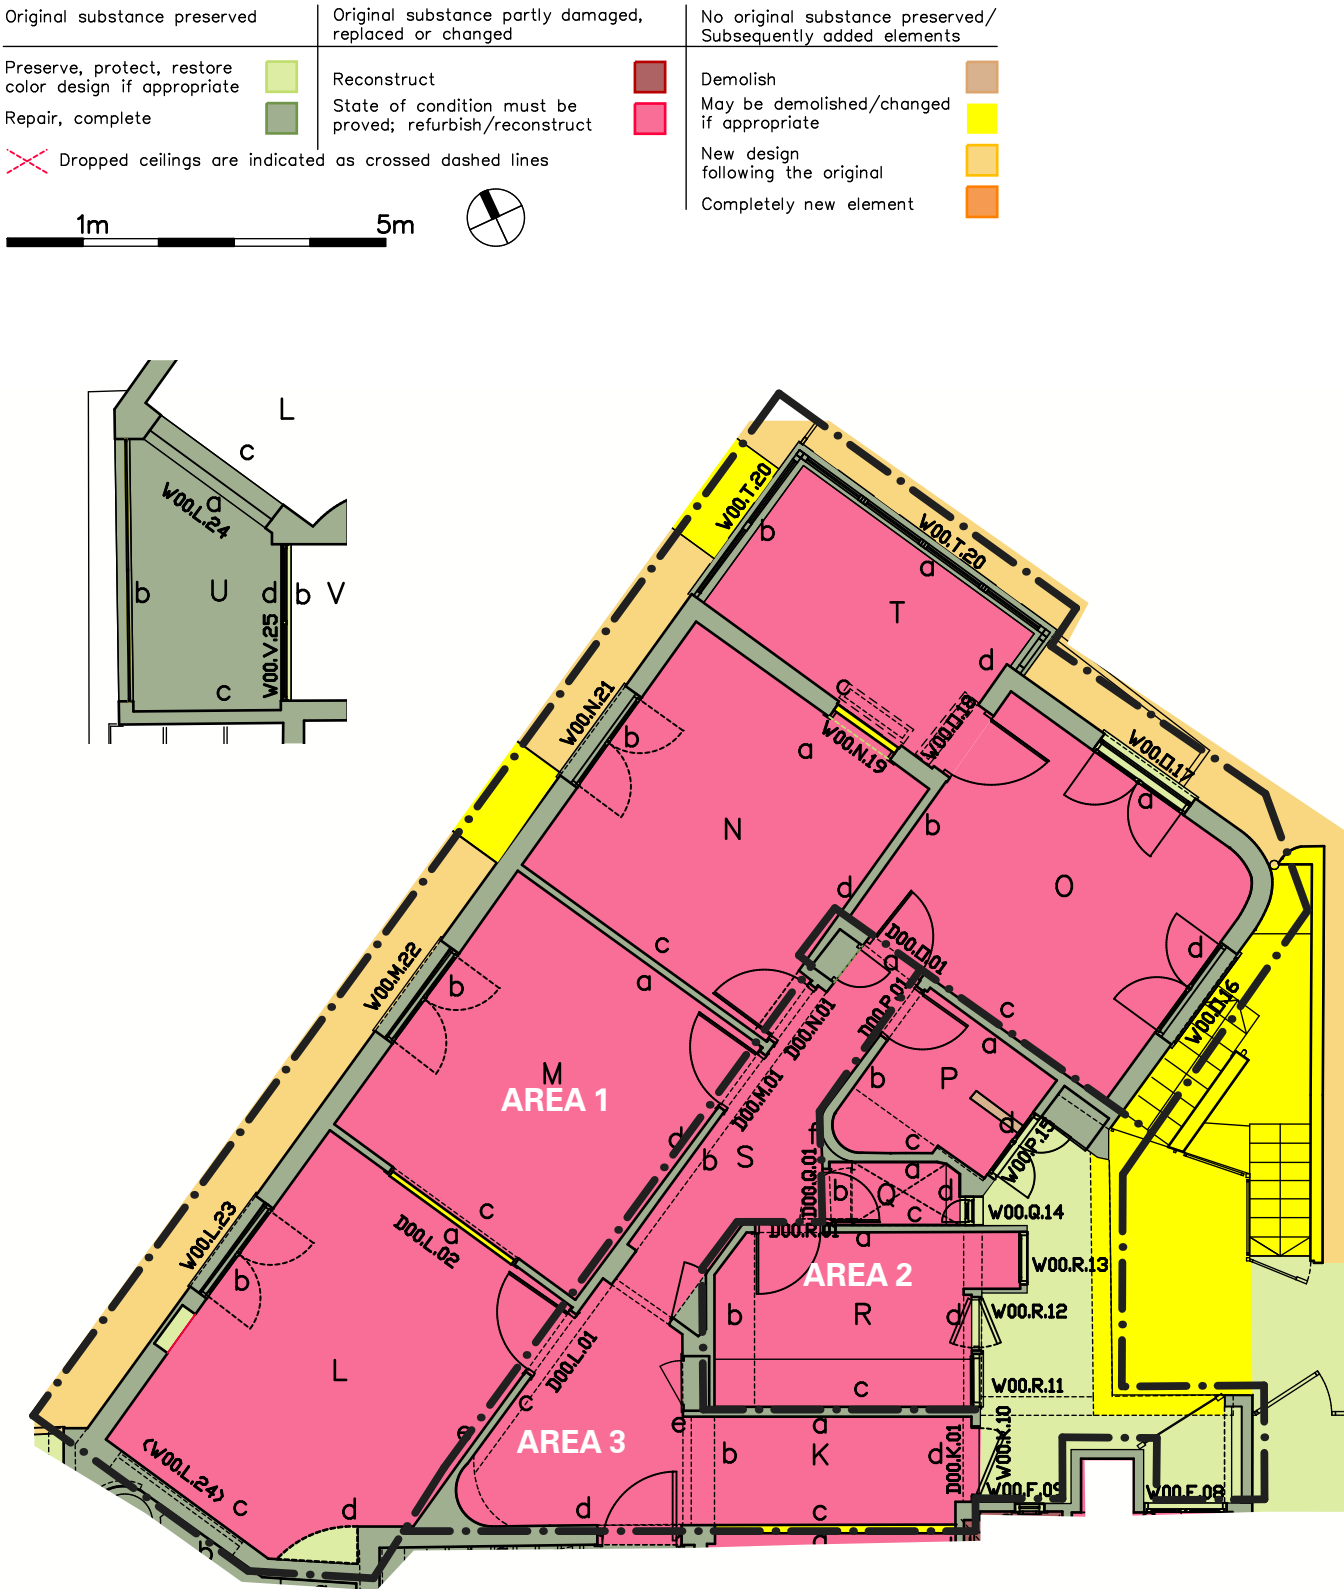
1st floor, apartment 2, preservation measures, walls and floors
